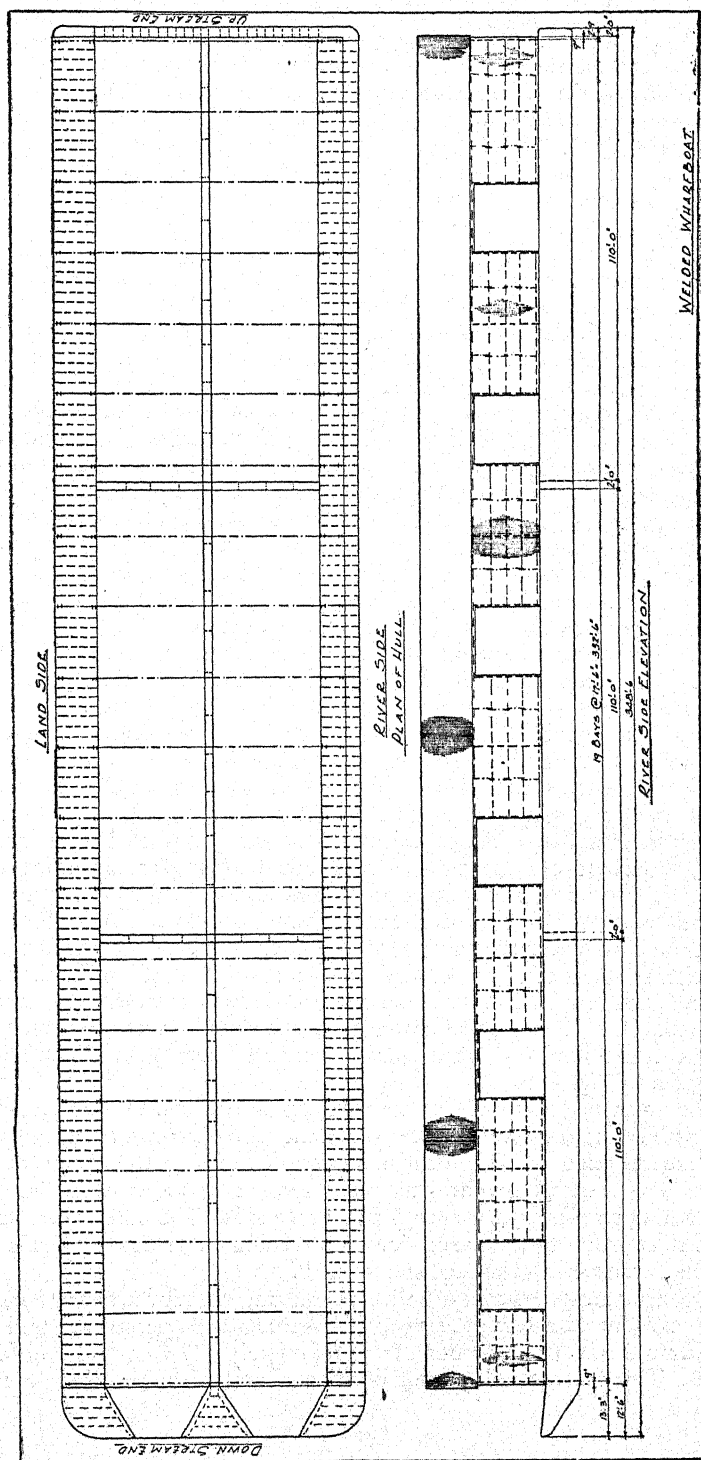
Plan and elevation of arc welded wharfboat.
